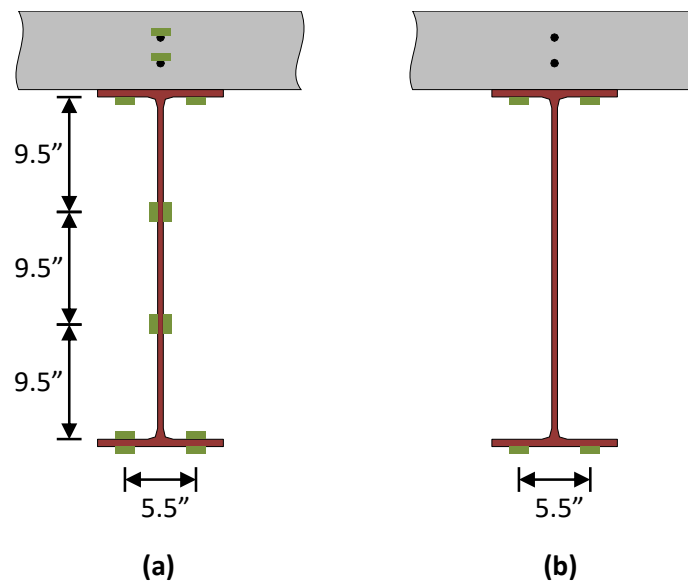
Cross Section Strain Gage Locations around Connectors for the (a) First Specimen and (b) Second Specimen
